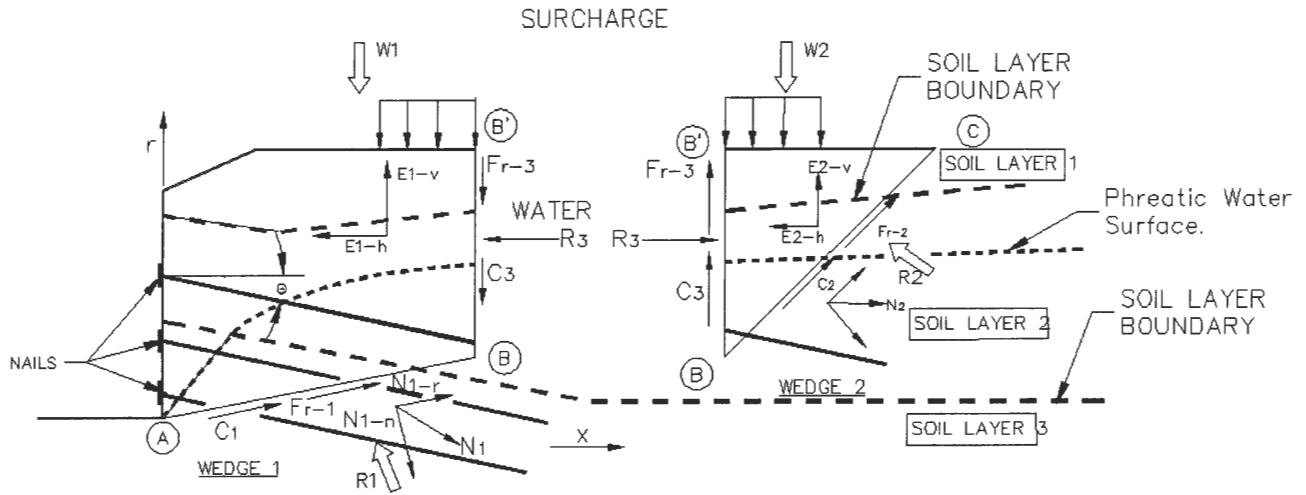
FAILURE SURFACE AND FORCES;
